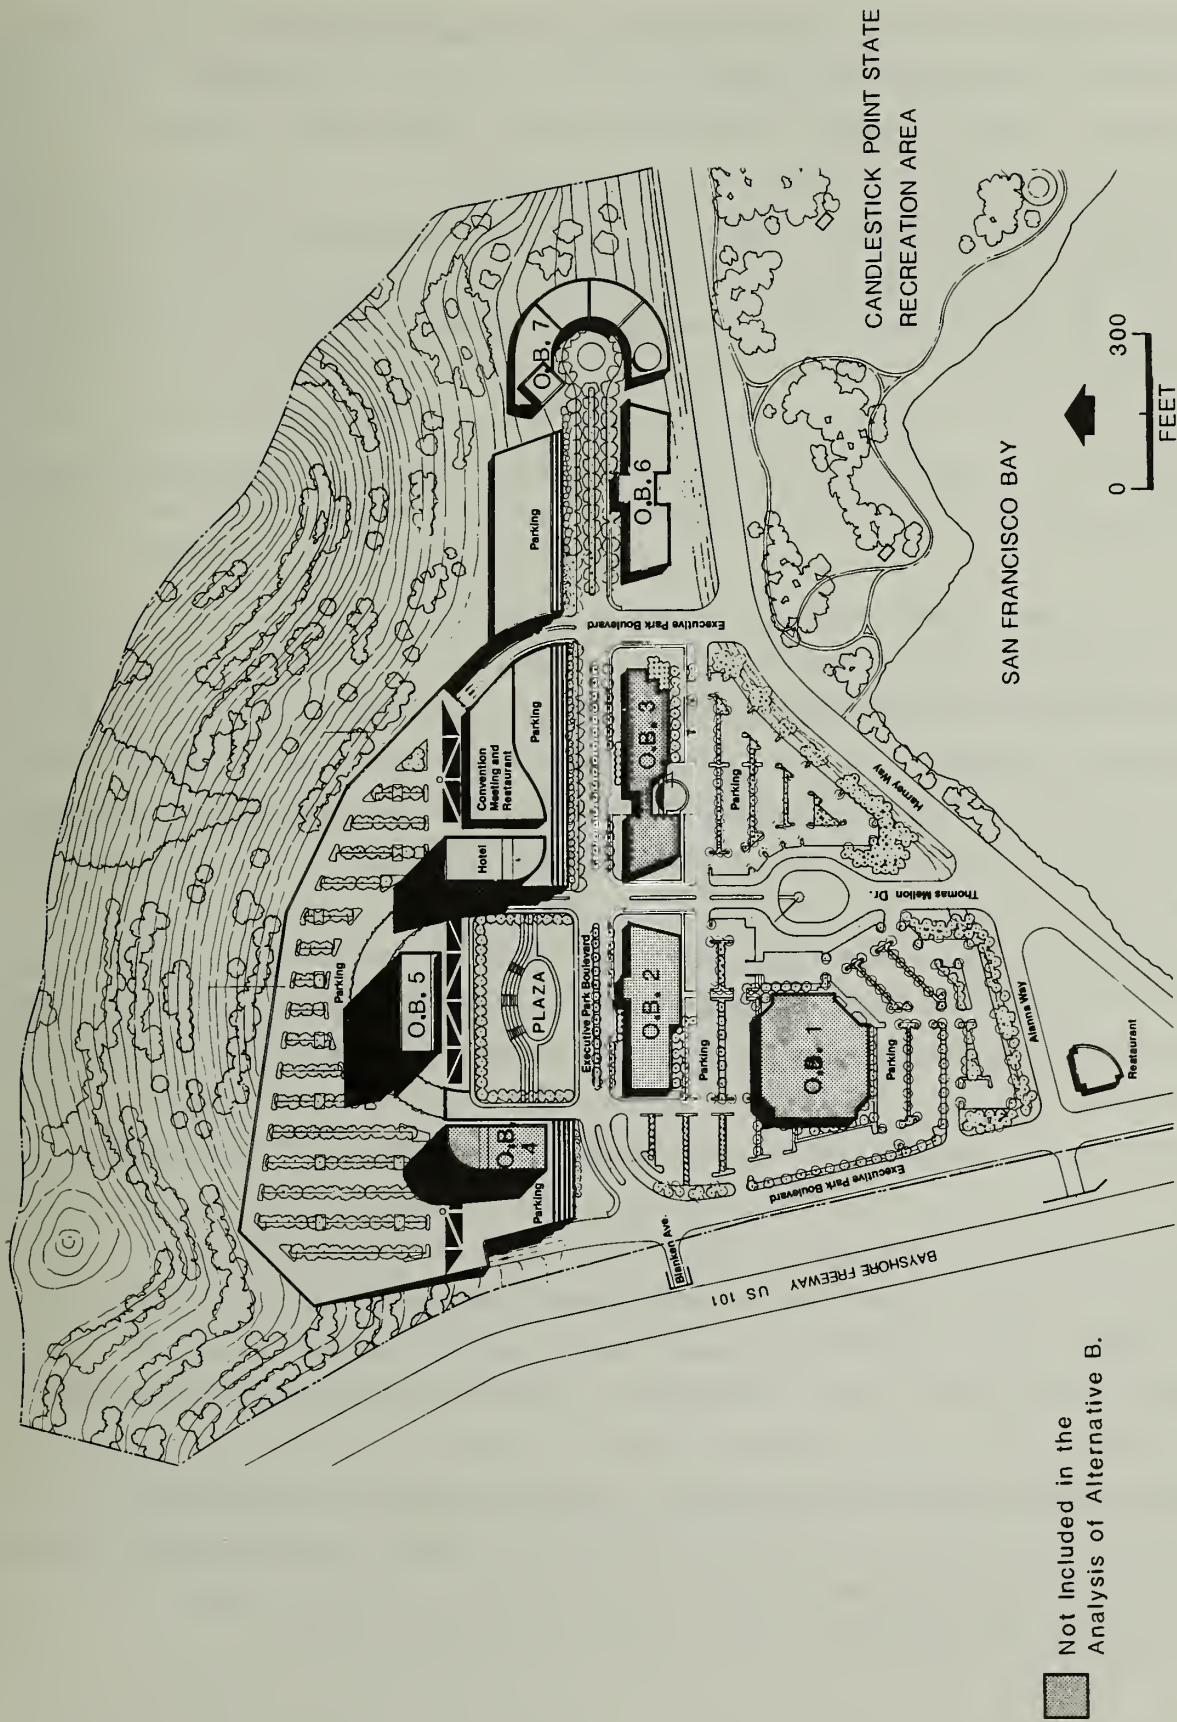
ALTERNATIVE B - YERBY MASTER PLAN
